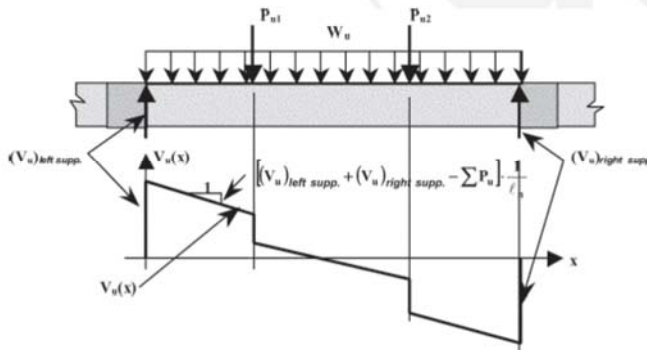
Calculation of the shear diagram of a girder, beam, or joist.
